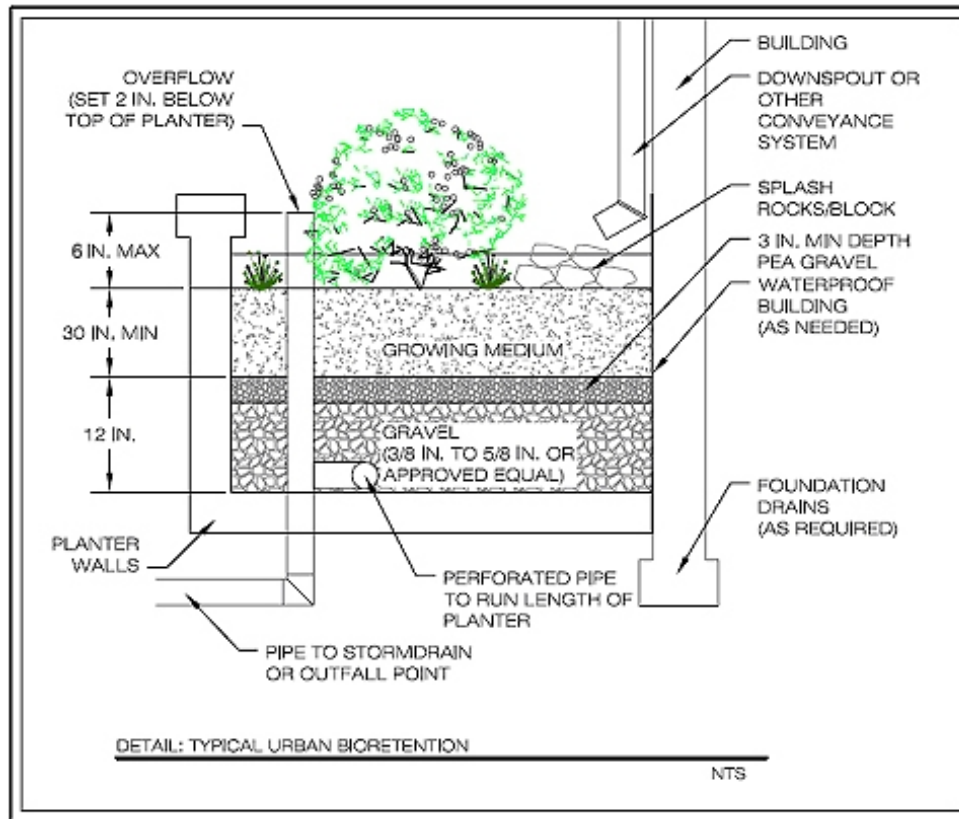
Stormwater Planter Cross-Section (source: VADCR, 2010)
